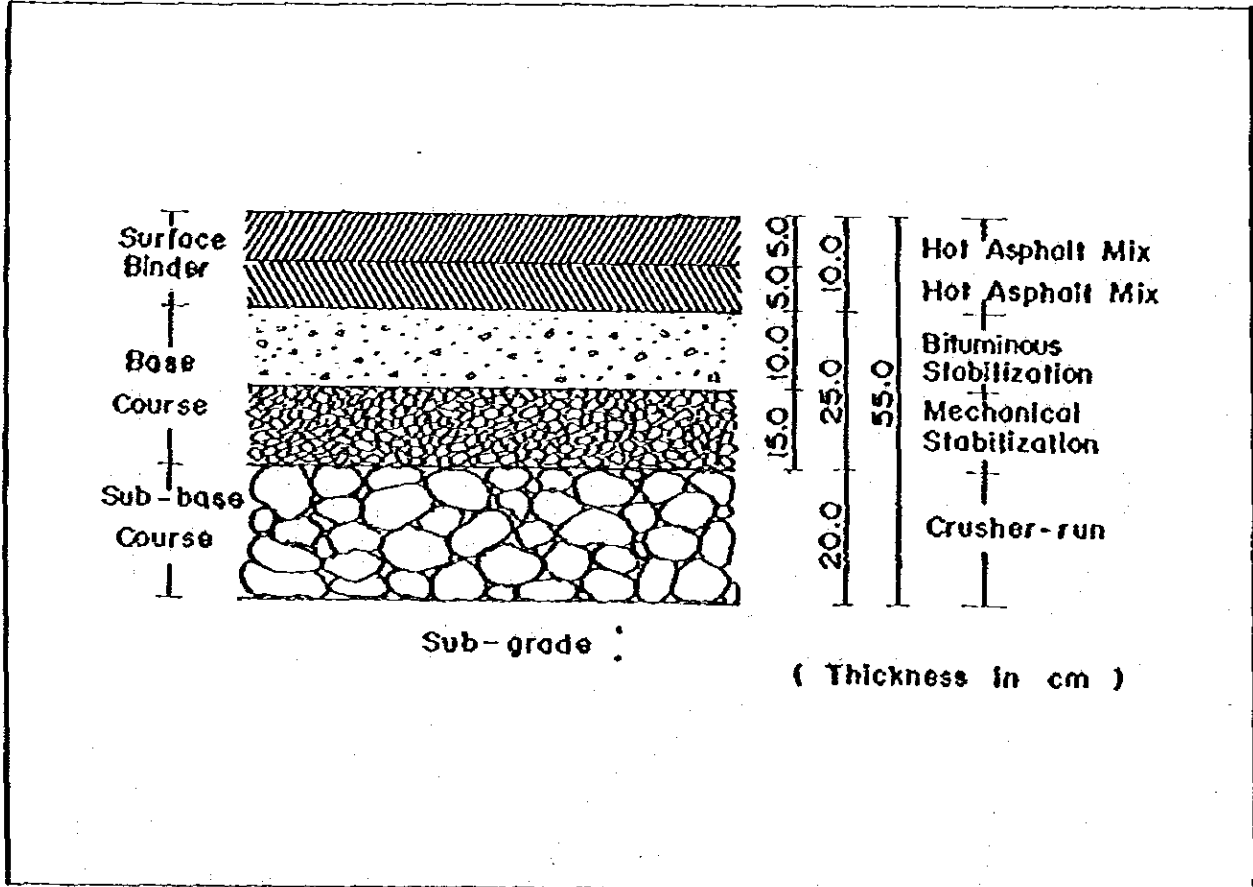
PROPOSED THICKNESS OF INDIVIDUAL PAVEMENT COURSE
